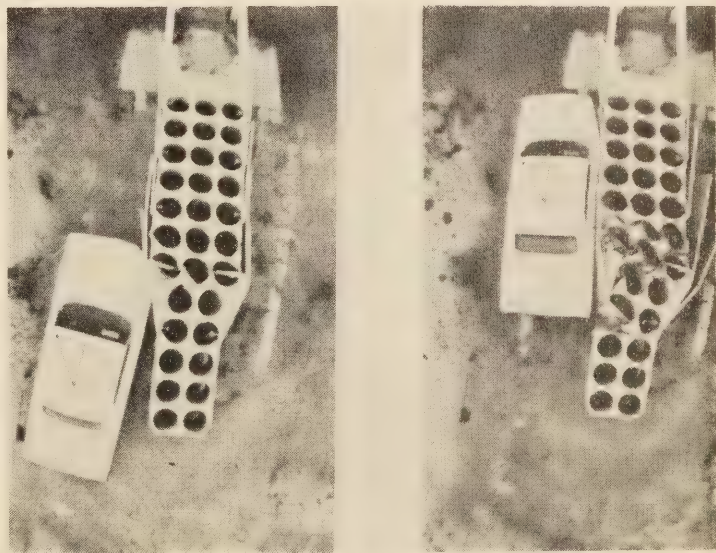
60-m.p.h., 10-degree test of a lightweight concrete barrier.
